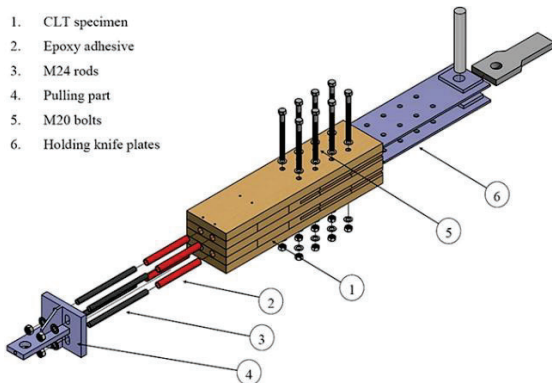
Exploded view of 5-layer CLT specimen with rods embedded perpendicular to the grain.
